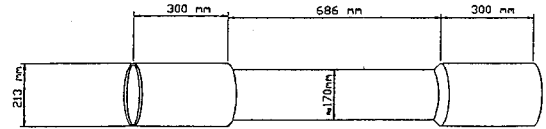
Test specimens of circular section prior to their being filled with concrete⁷⁾
